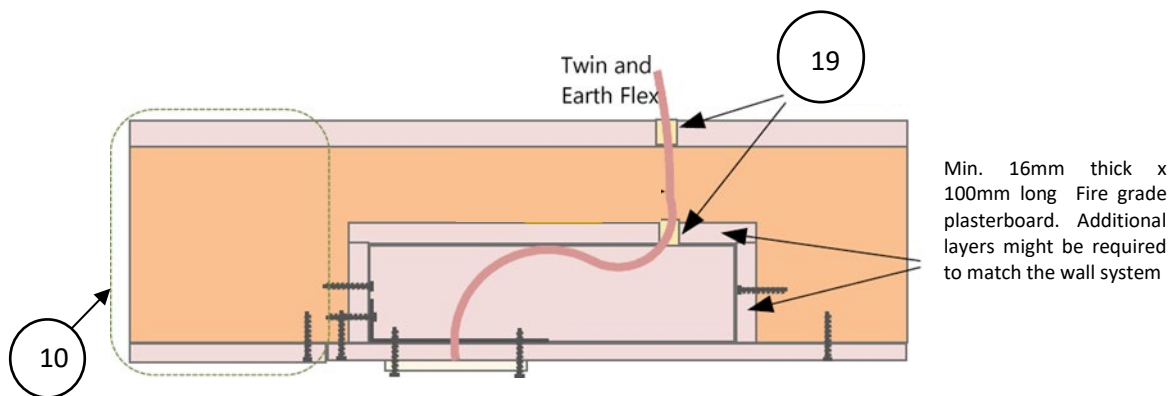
Framing out of GPOs in massive timber construction – Plan view
